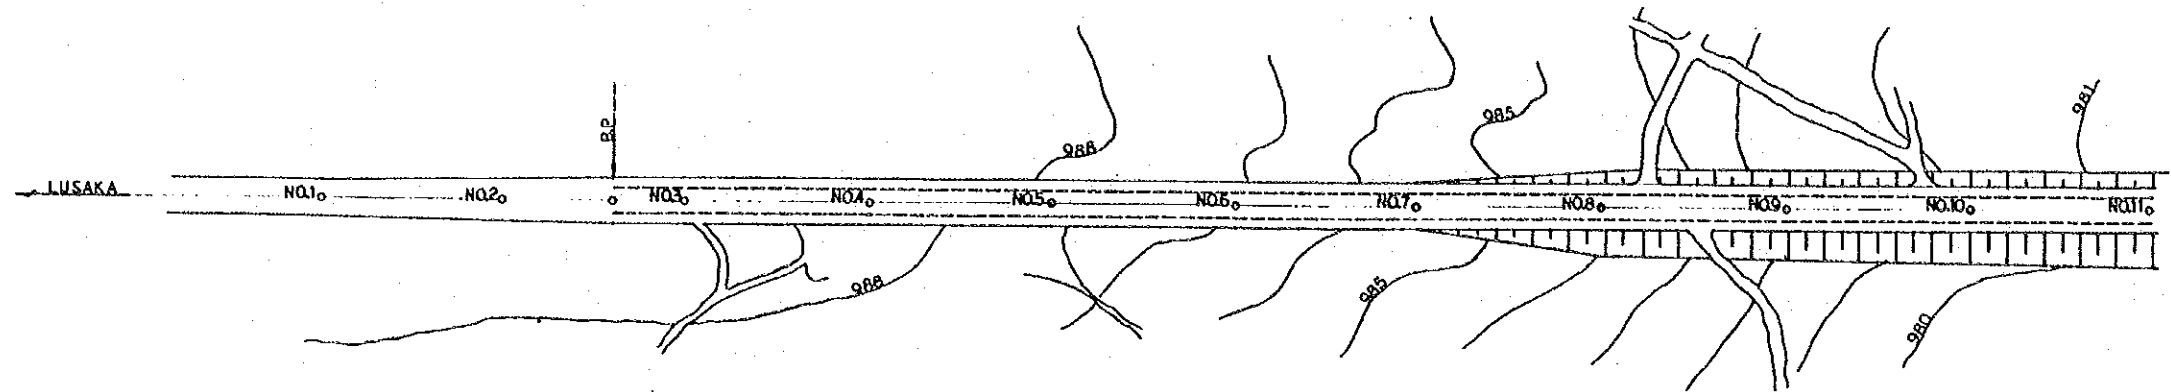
Primary Dimension of Substructure and Foundation (A2-2/2)
